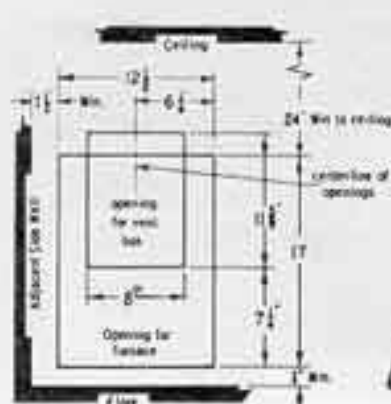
Front view showing furnace cabinet and outside wall cutout for vent box
